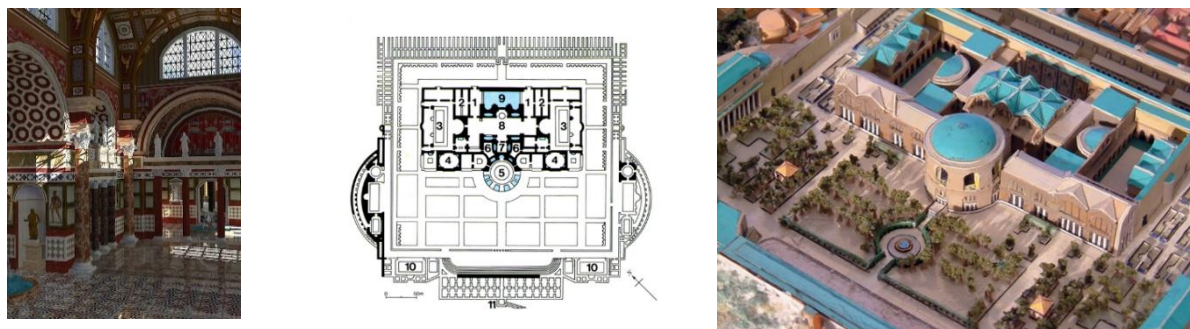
Baths of Caracalla: a) Interior view, reconstruction [6]; b) plan, [7]
